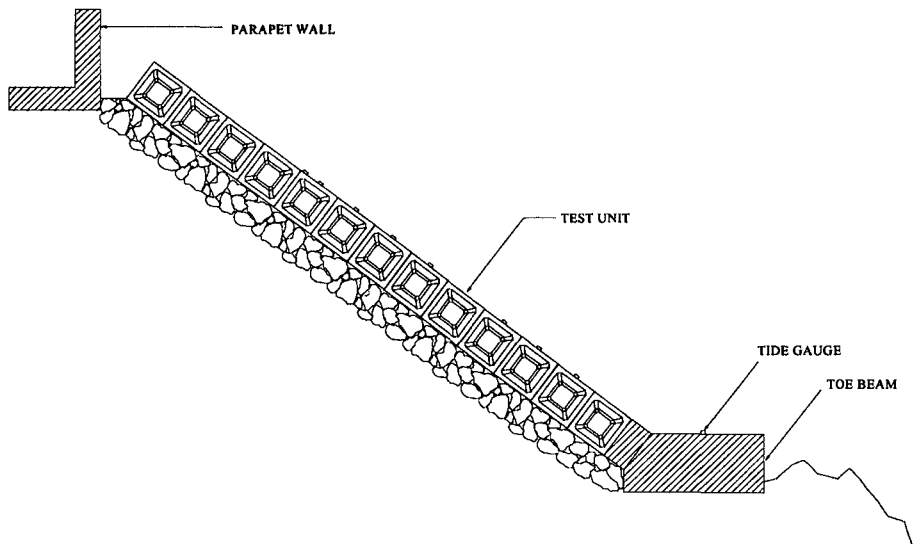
Typical cross-section of LaCollette Breakwater, Jersey, UK
